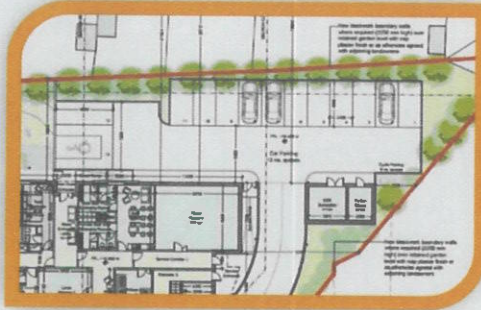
FIGURE (i) Extract from Site Layout Map (Drawing No. W: 16 JOBS P-S-250A lodged with reply to Further Information on 4th of July 2017. It shows the car park 13 spaces required. It shows the dimensions of the ESB Substation from the Boundary wall and the house of No. 6 Forster Court.
